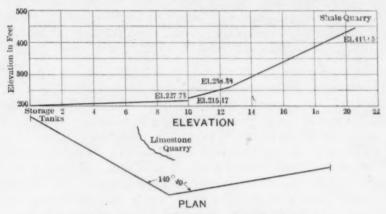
Profile Showing Elevation and Plan of Conveyors
